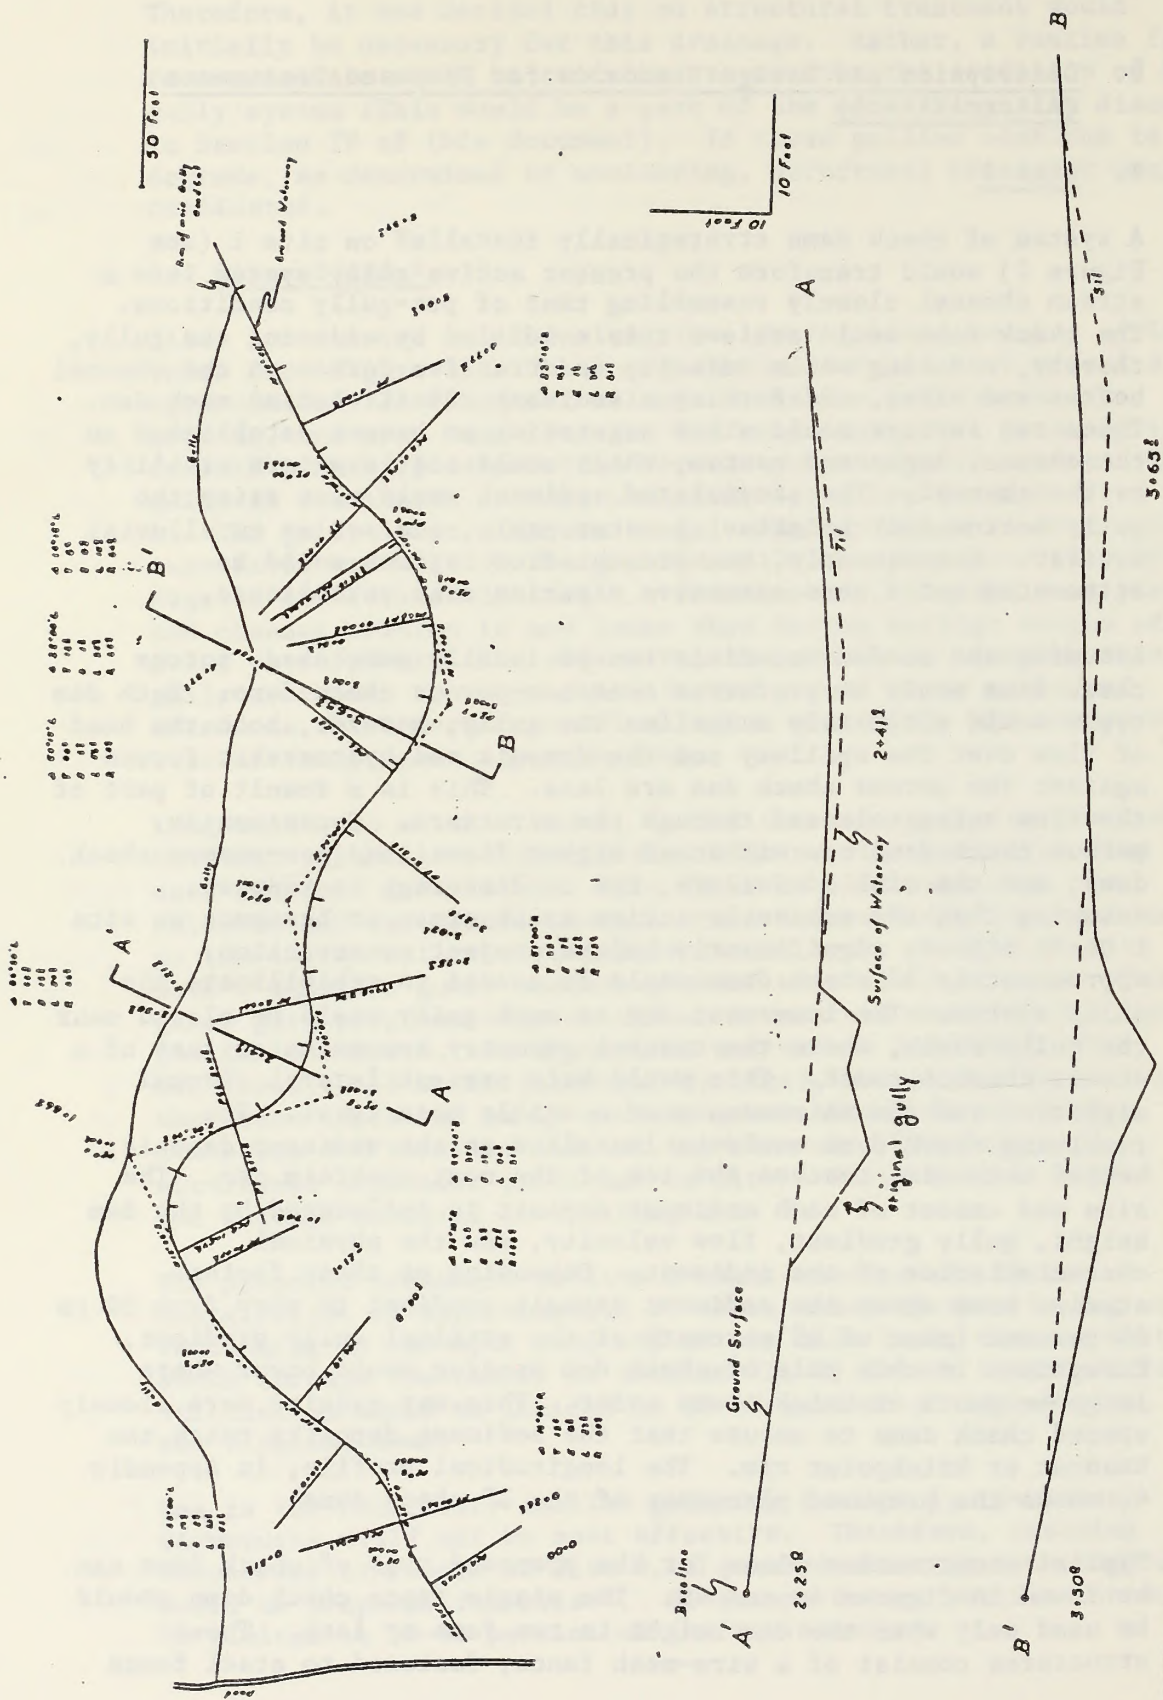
PLAN AND PROFILE OF A TYPICAL GRASSED WATERWAY
